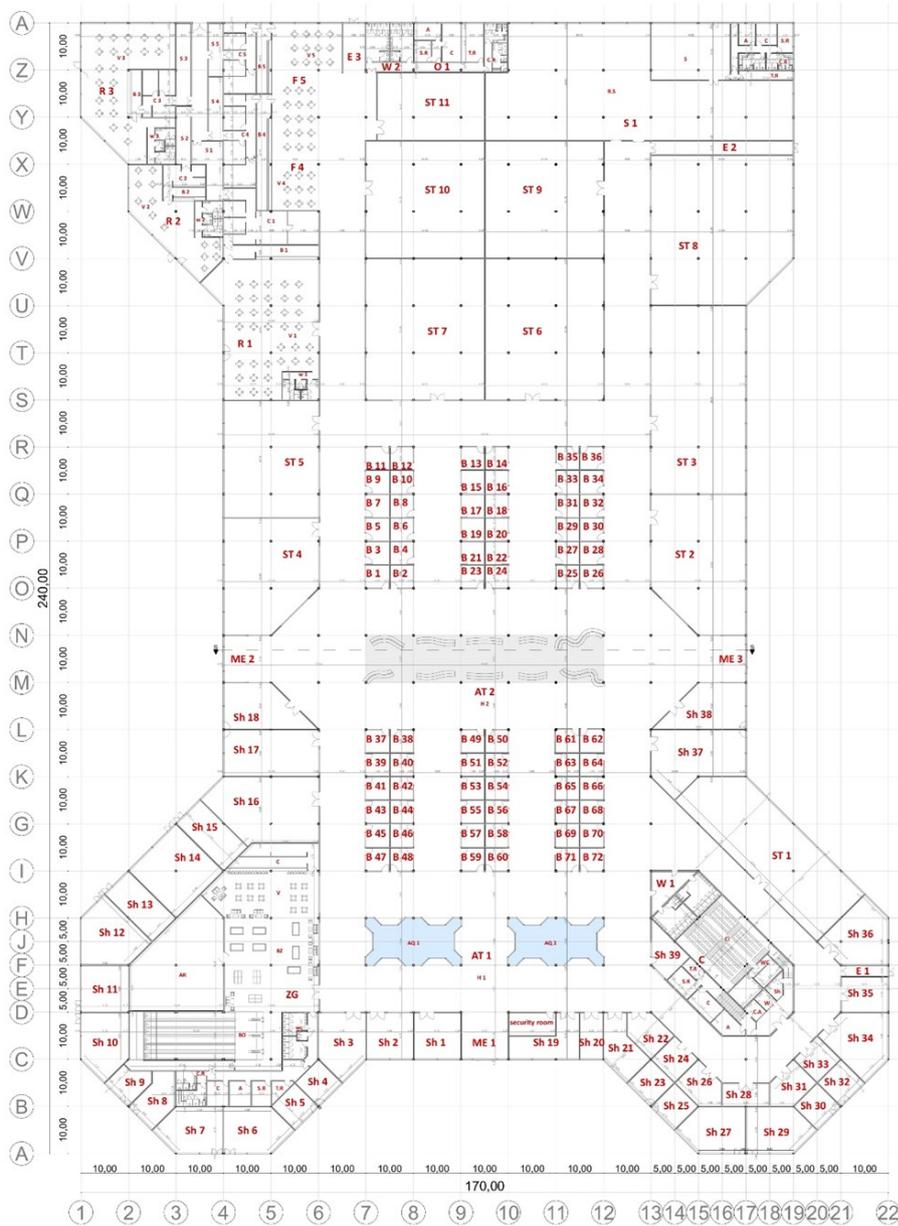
Layout of the main structures of the ground floor of the shopping mall
